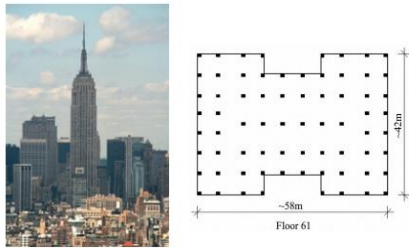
Empire State Building, New York, USA, 1931(photo courtesy of Antony Wood/CTBUH)
